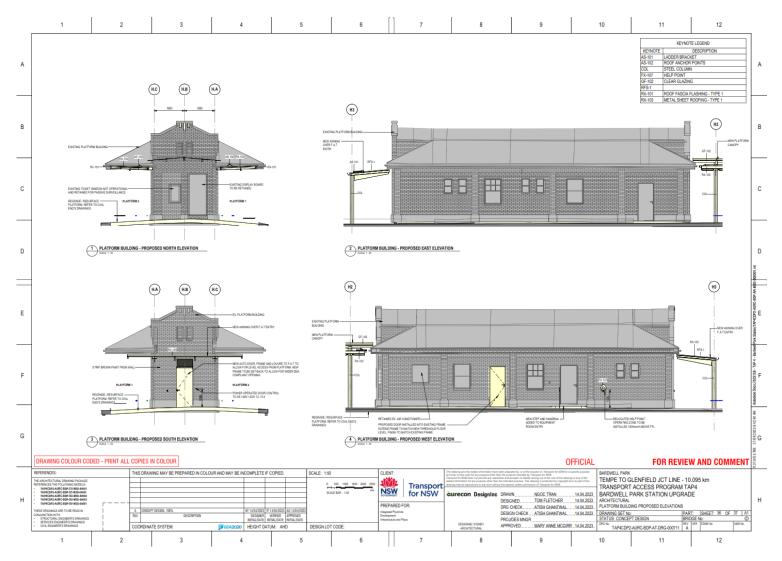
Proposed elevations for Platform Building at Bardwell Park Station (Source: Aurecon, 2024)
